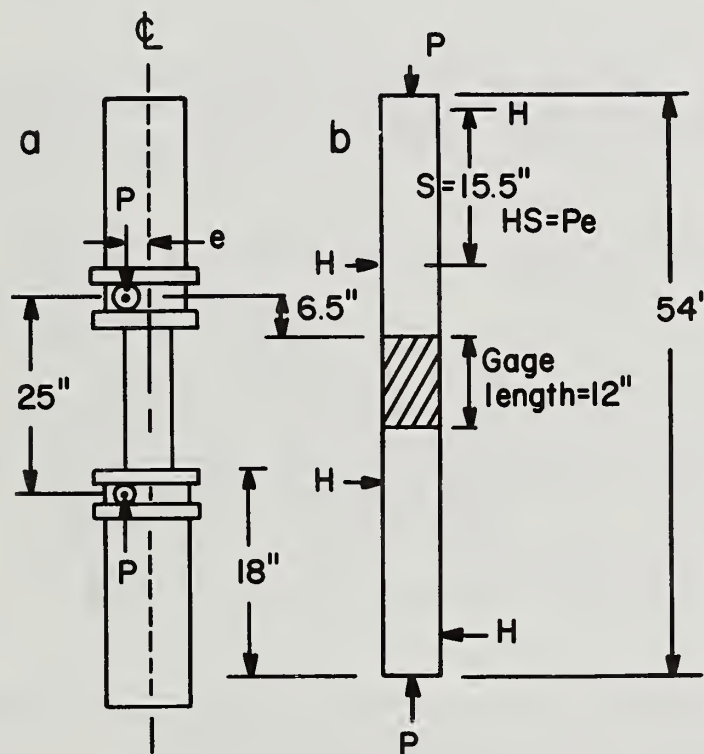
Diagram of (a) eccentric axial load applied to boots (hollow grips) with test member inside, and (b) test member showing contact forces exerted by boots. Distance S (15.5 in.) was large enough to prevent H from causing shear failure in boot (ML845426).
